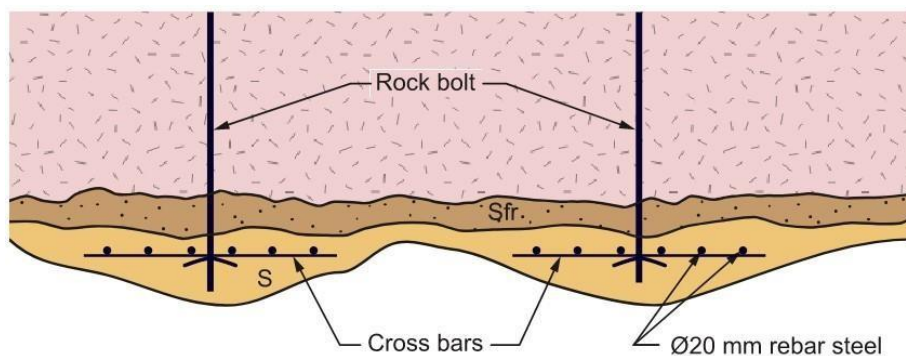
Typical layout of RRS construction (NGI (2015))
